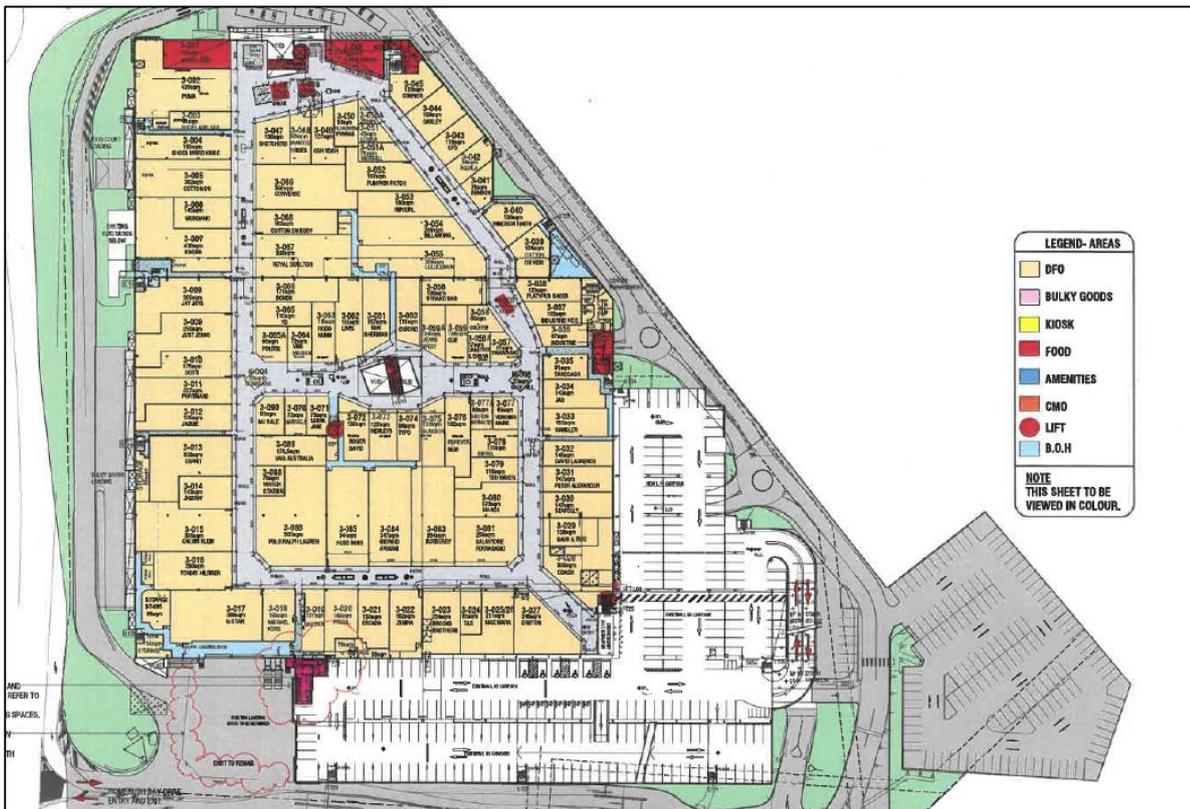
Approved Tenancy Layout Plan as per DA2008/087/6.
